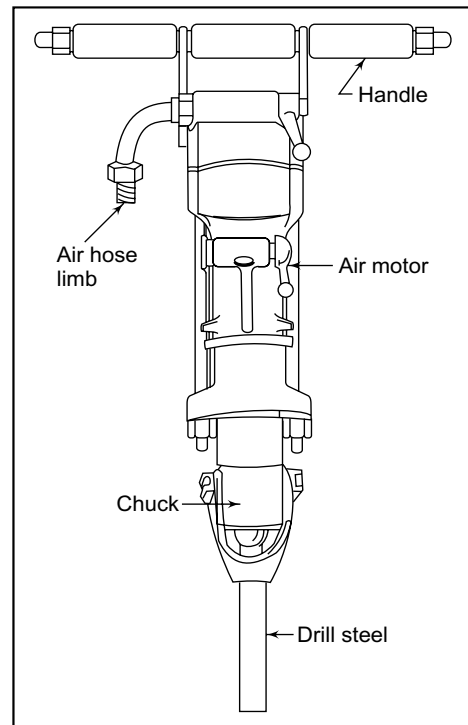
Hand-held water-flushed rock drill (Jack hammer) suitable for shot hole drilling and horizontal drilling in open wells
